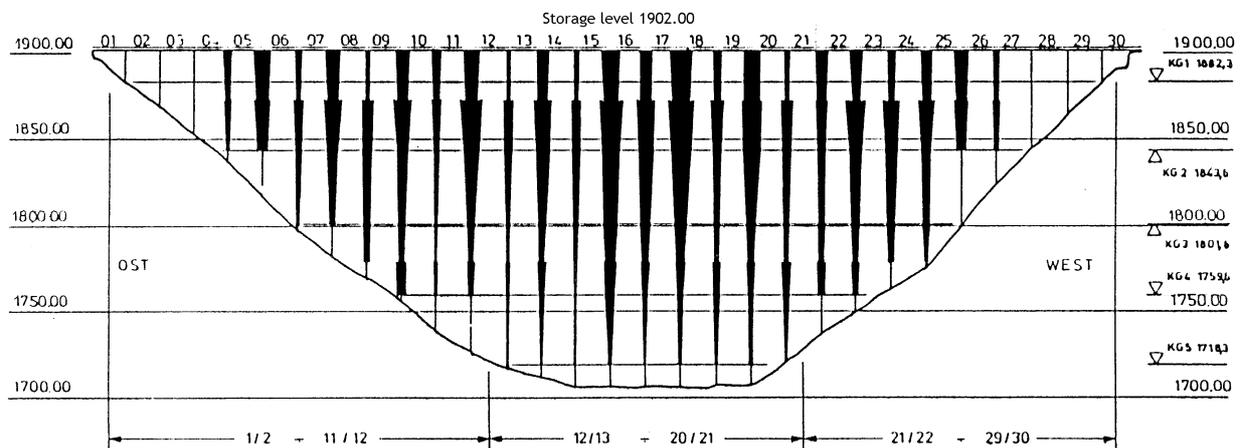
Kölnbrein dam. Opening of the contraction joints due to intense grouting.
